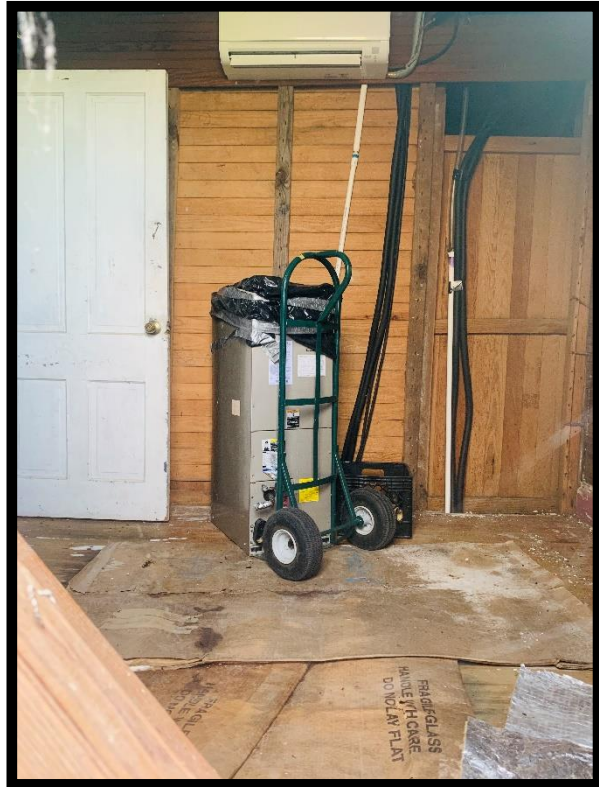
Berry House, Rear Room, Looking Southwest. Note possible original door on left.
